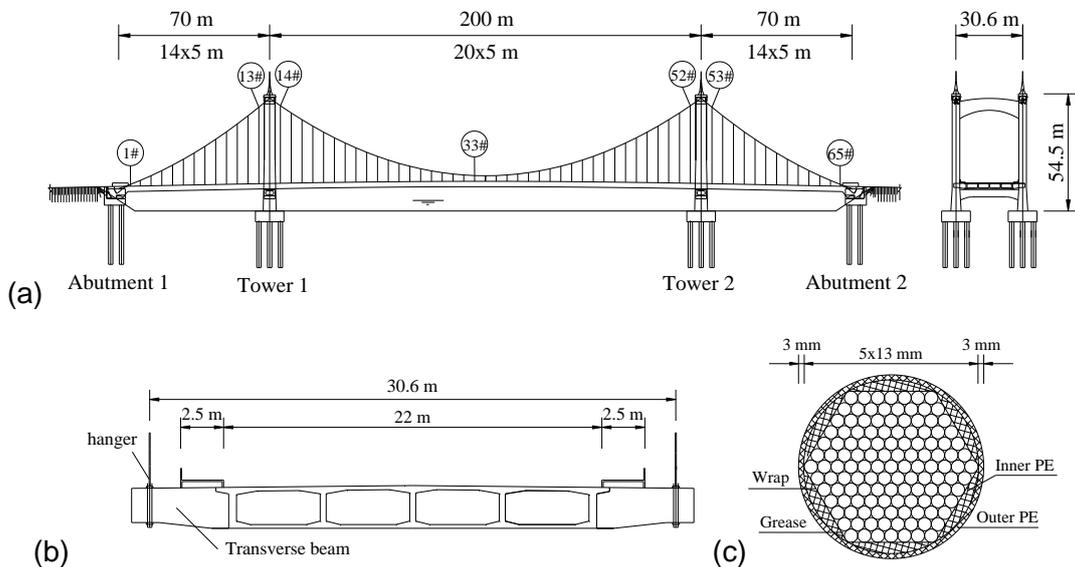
Prototype self-anchored suspension bridge (a) general layout (b) cross section of stiffening girder (c) cross section of hanger
